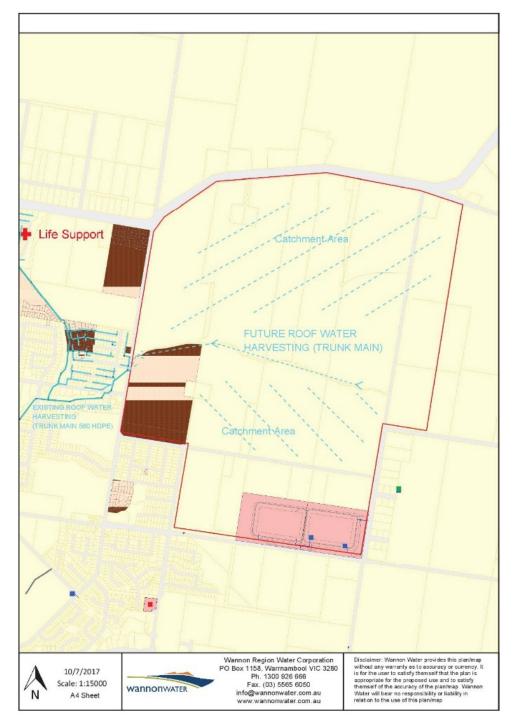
Roof Water Harvesting Infrastructure Requirements (provided by Wannon Water)
